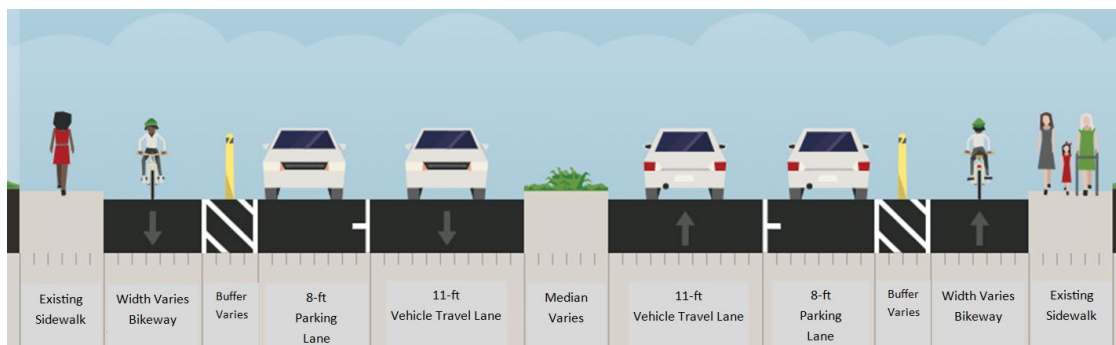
Typical Cross-Section from El Camino Real to South of E. Park Drive
